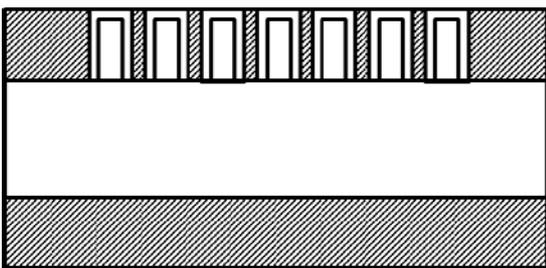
District heating pipe with uncovered cylindrical test specimens still attached to the service pipe.
